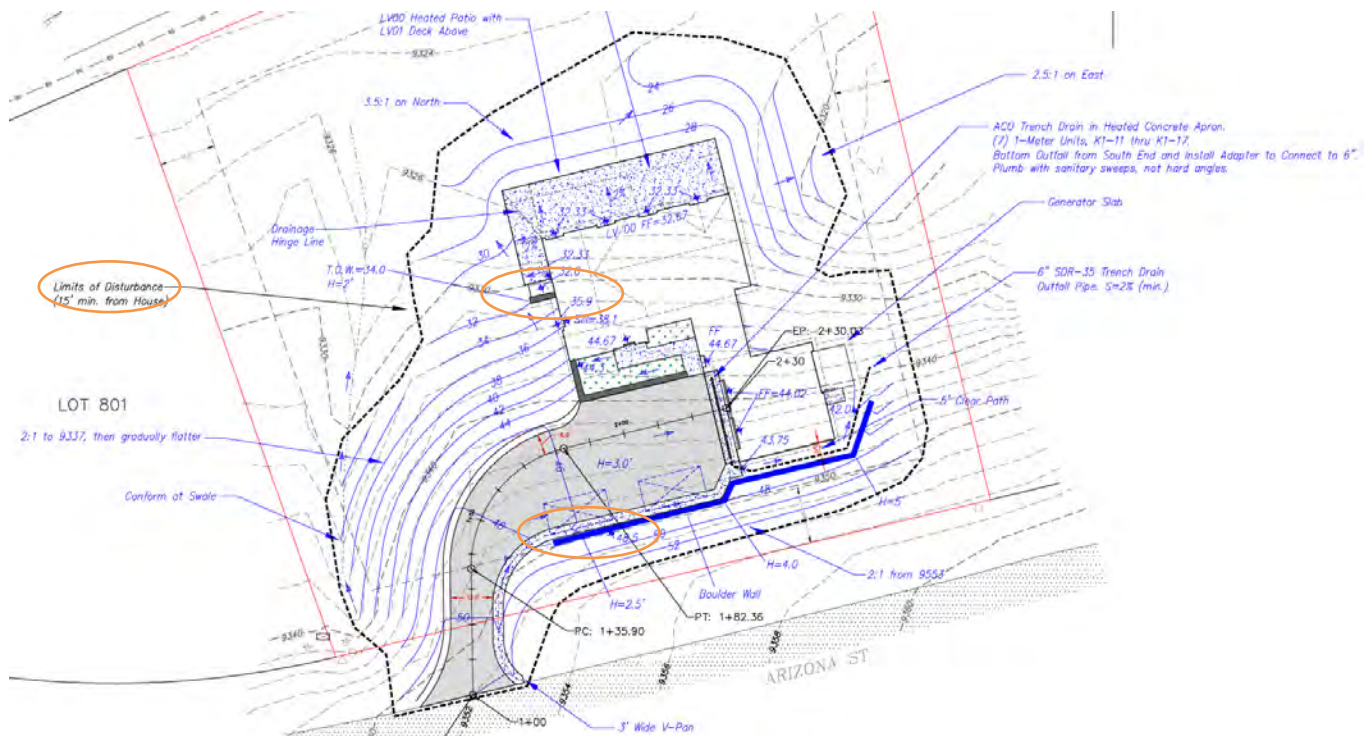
Grading – Civil plan showing Limit of Disturbance and new concrete wall
